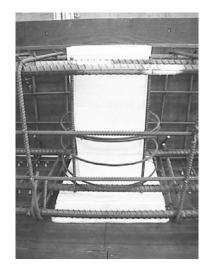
Trestle Pile Bent—Footing and Pile Stub Schematic
